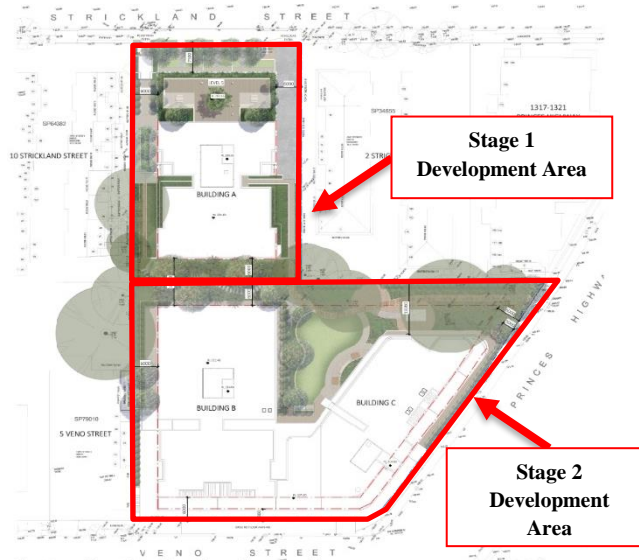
Proposed Development Plan (Extract from Architectural Plan)
